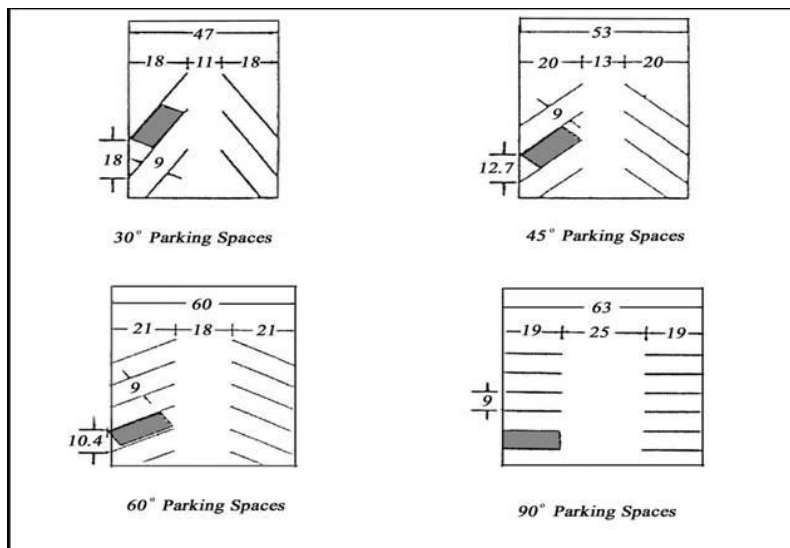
Drive Aisle and Parking Space Dimensions
